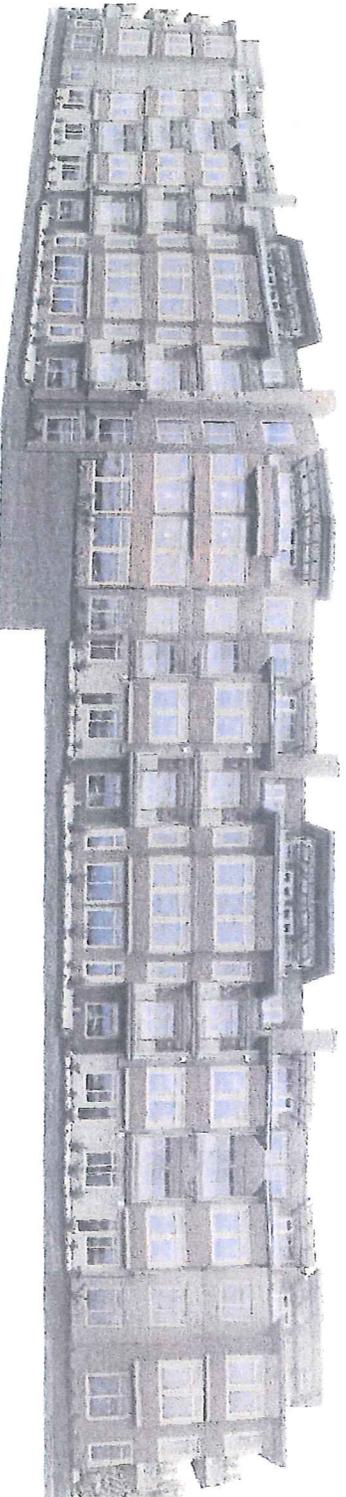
PHOTO COMPOSITE OF PROPOSED BUILDING 10 - MODIFIED ROOF PLAN
